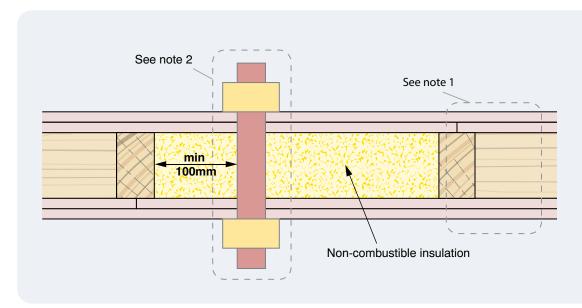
Plastic pipe penetration through fire-protected timber-framed walls with non-combustible mineral fibre insulation.
